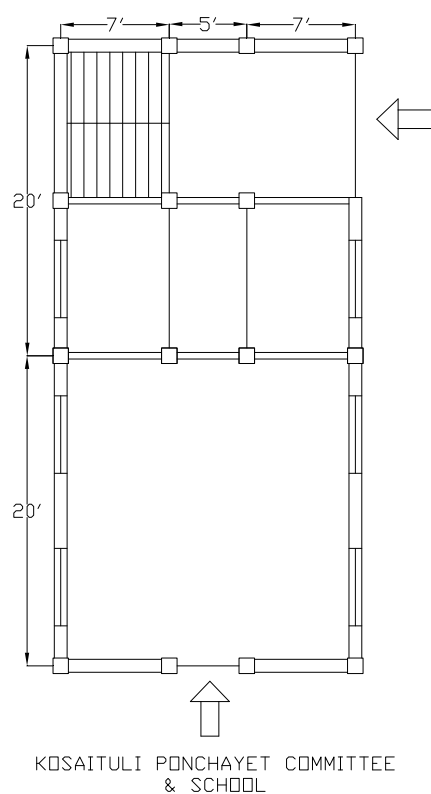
Building Plan of Kosaituli Panchayet Committee and School
